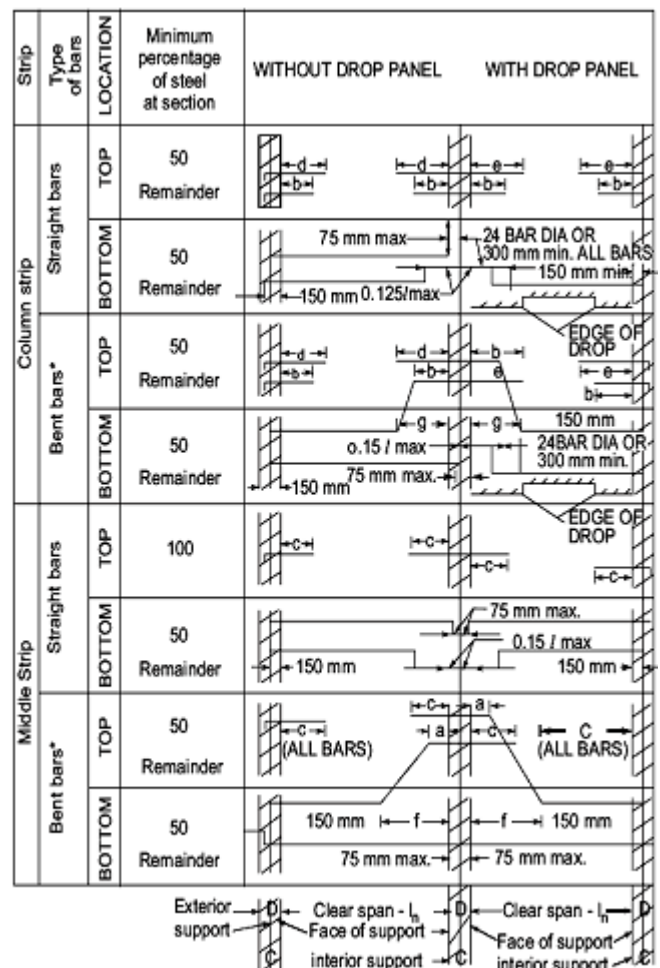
Minimum Bend Joint and Extension for Reinforcement in Flat Slab (IS 456-2000)
